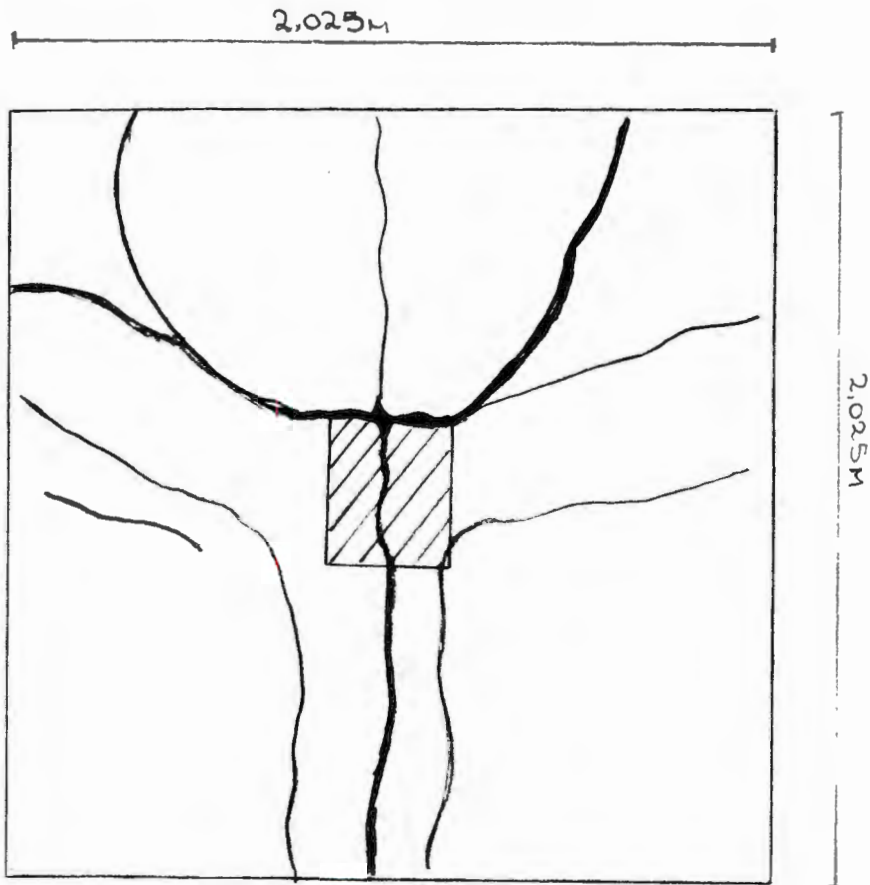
(a) : Crack pattern of mesh reinforced slab 1, failure occurring along dark lines
